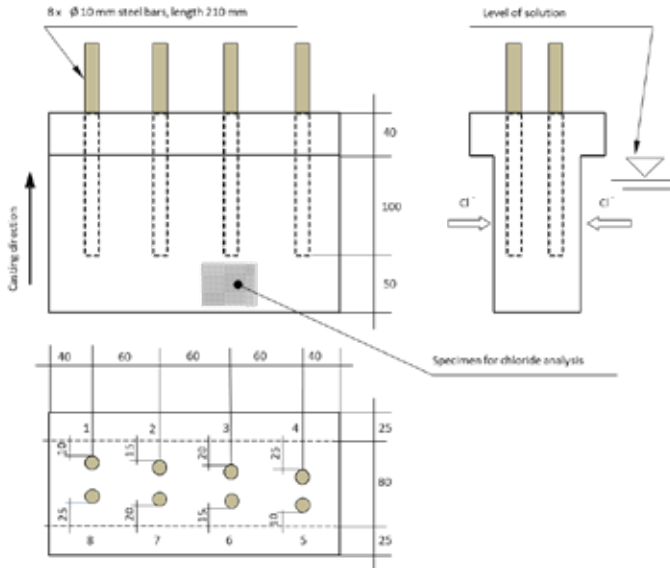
Concrete specimen with embedded steel bars, the dimensions are given in mm.
